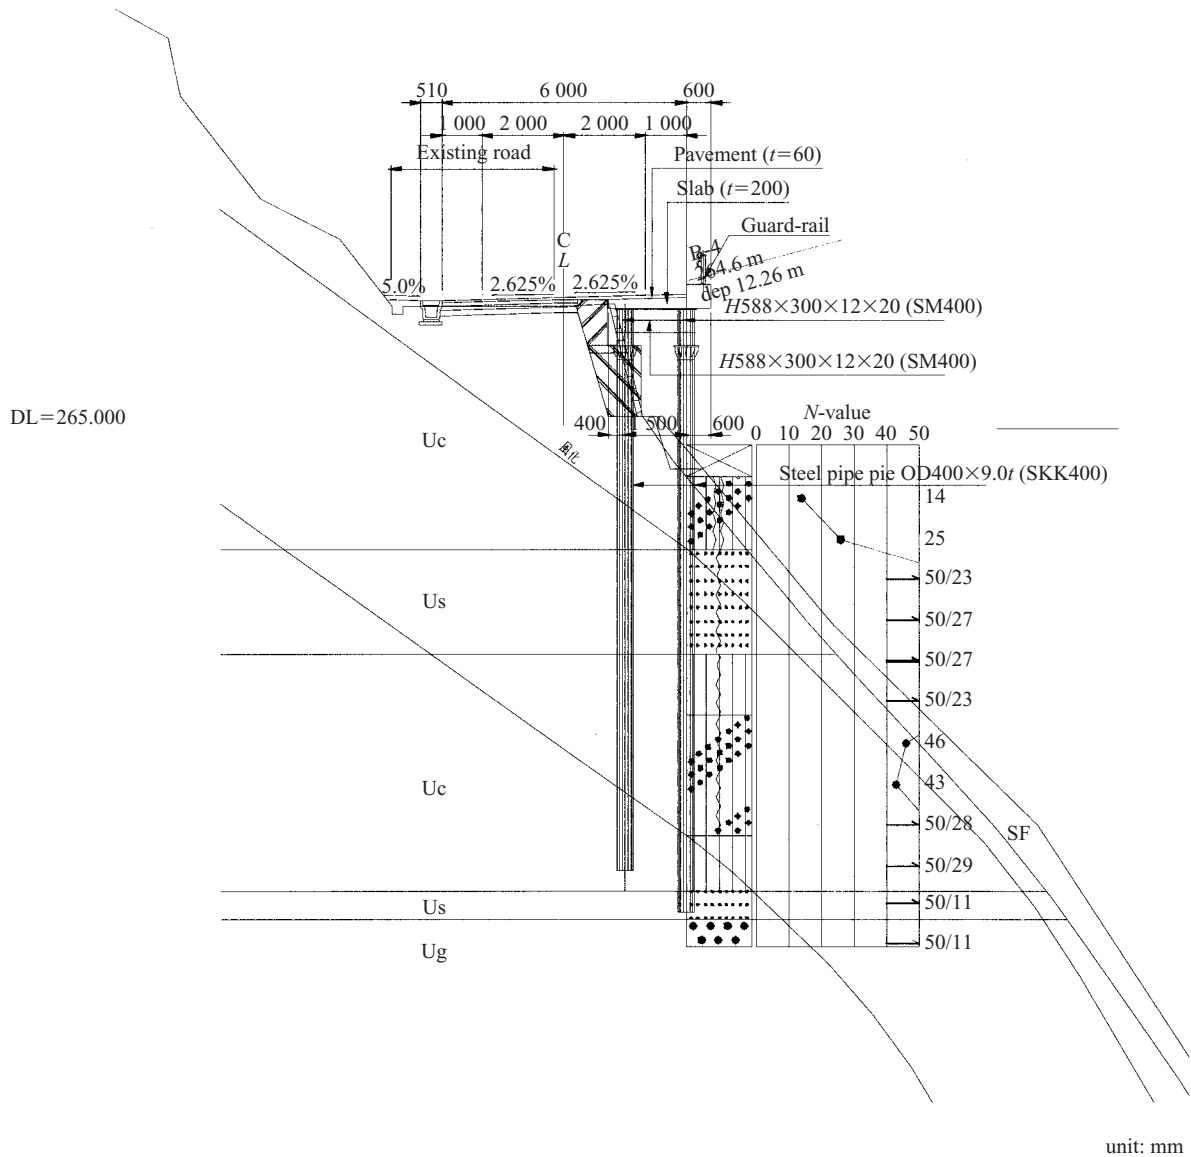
Typical cross-section of Sanada-Takashima Metal-Road (Point No. 4 at C-Block)
